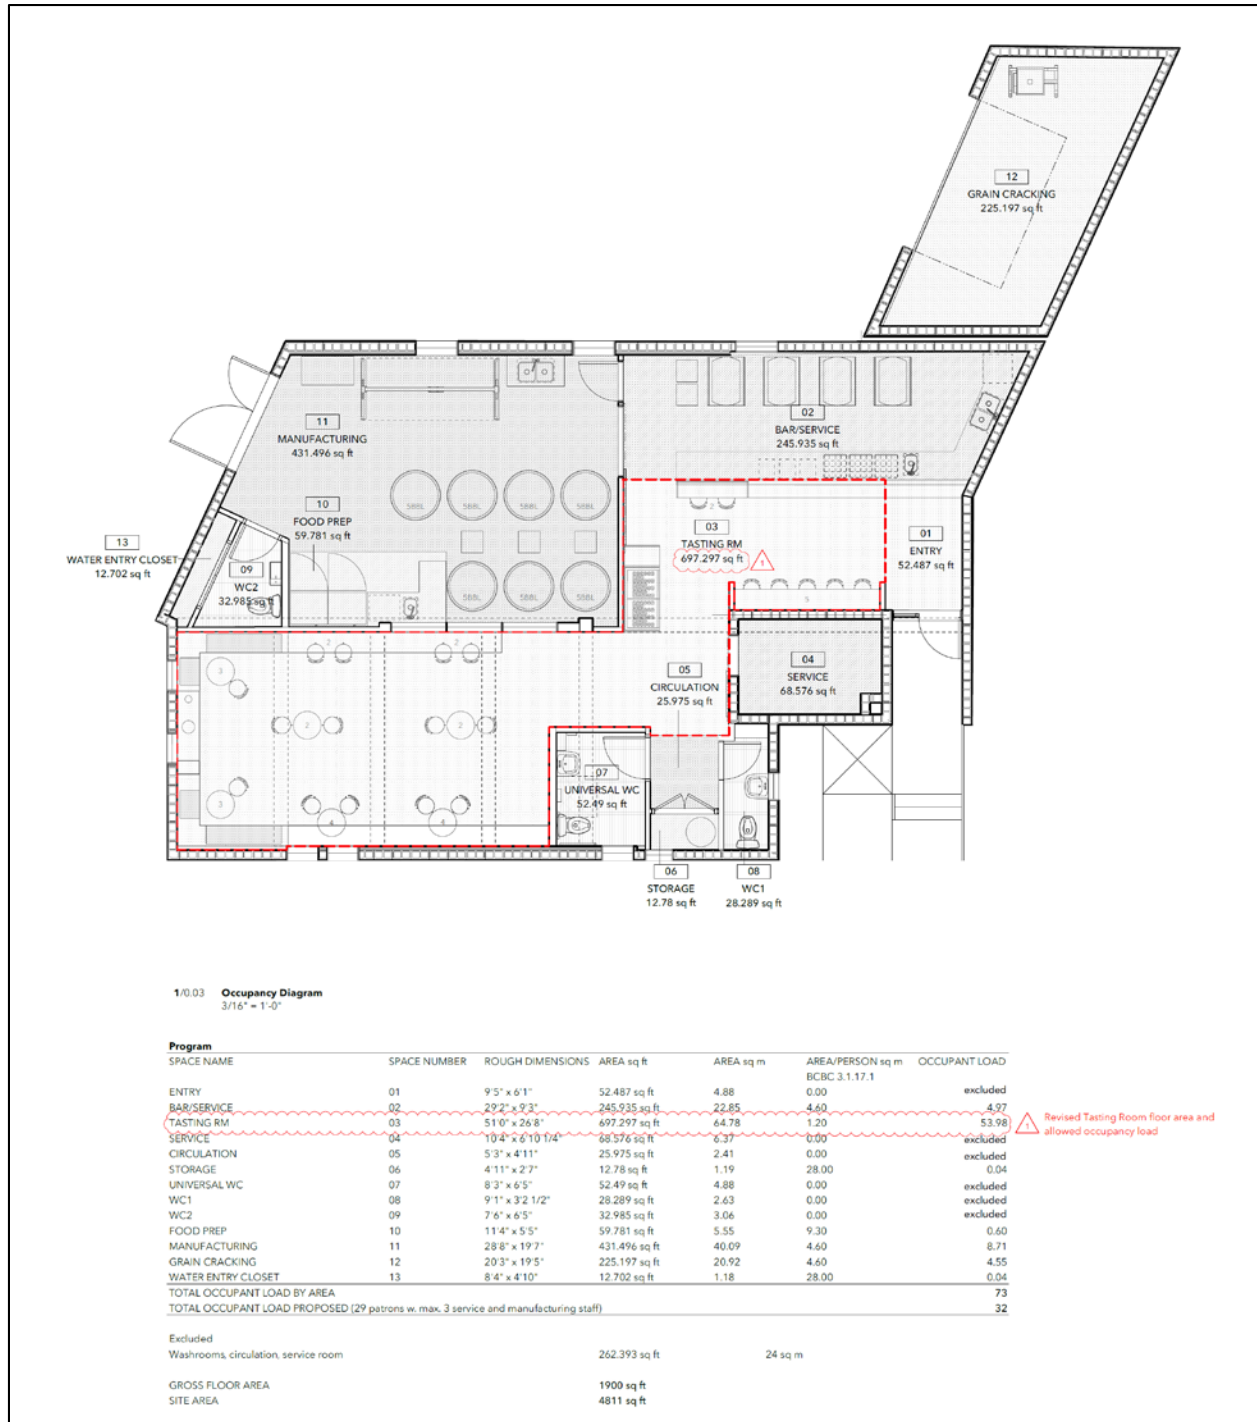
Brewery Floor Plan prepared by Simcic + Uhrich Architects, dated December 18, 2020
